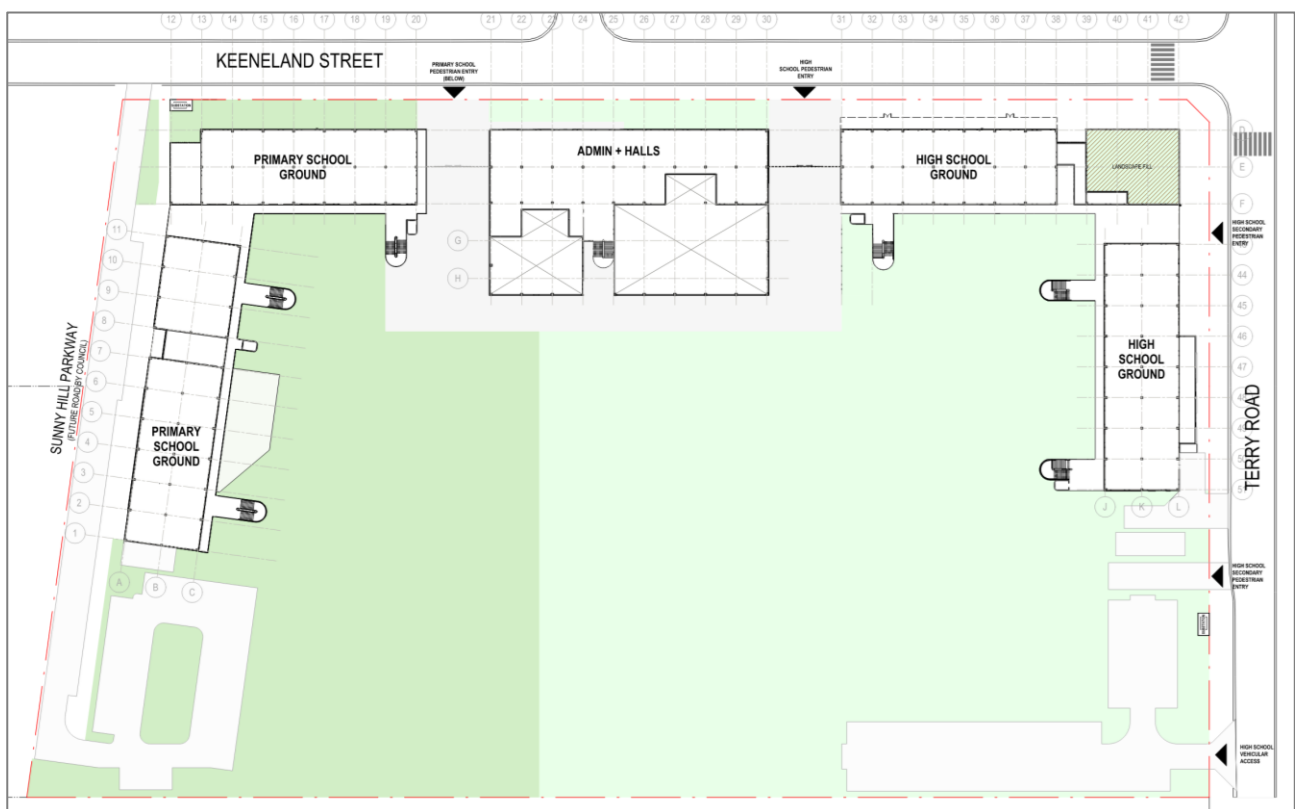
Draft Architectural Ground Floor Plan (Source: Architectus)
